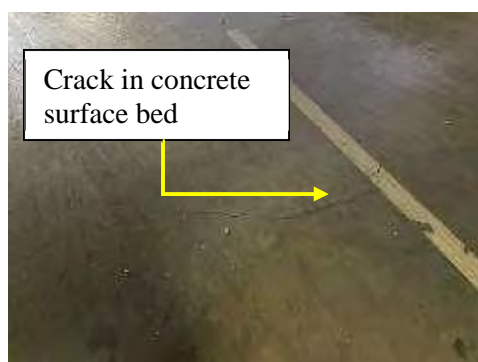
Showing cracking of the existing concrete surface bed slab at basement level
